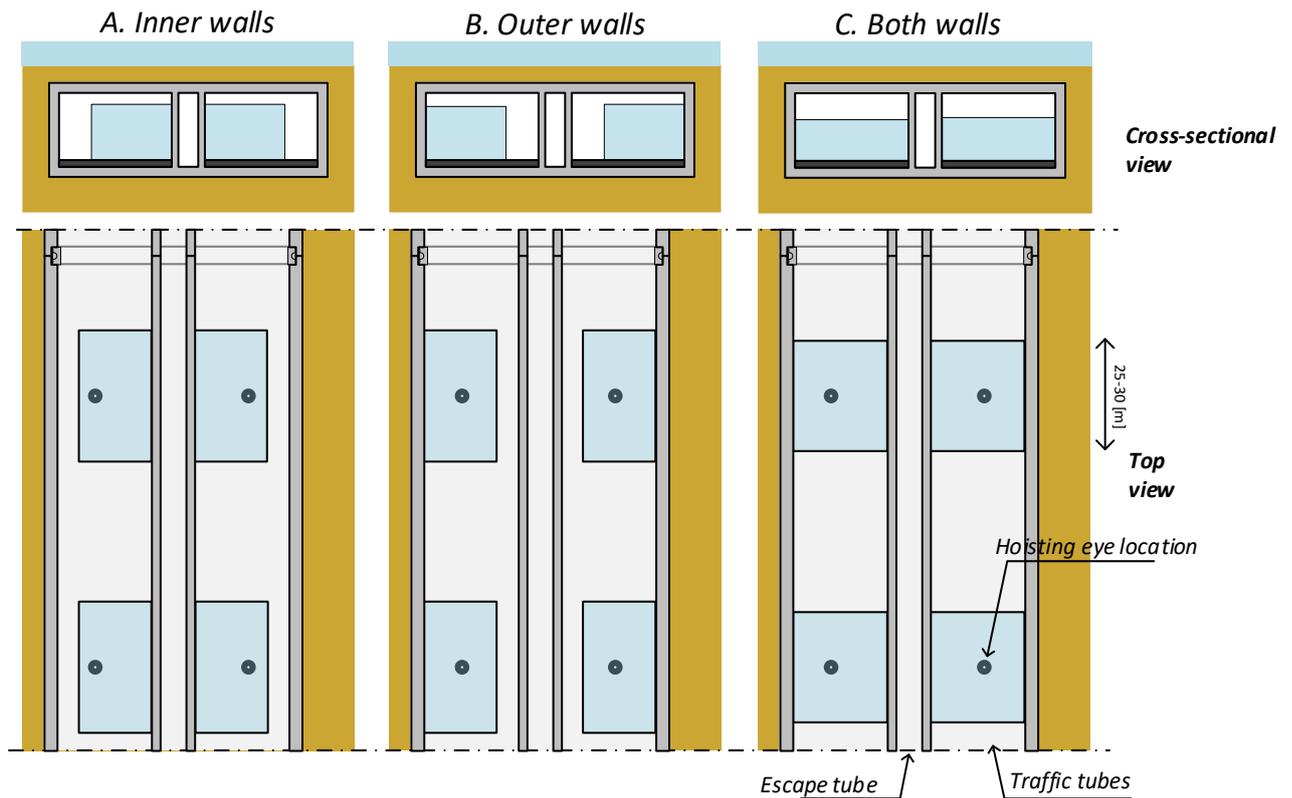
, BALLAST TANK DESIGN LAY-OUTS
